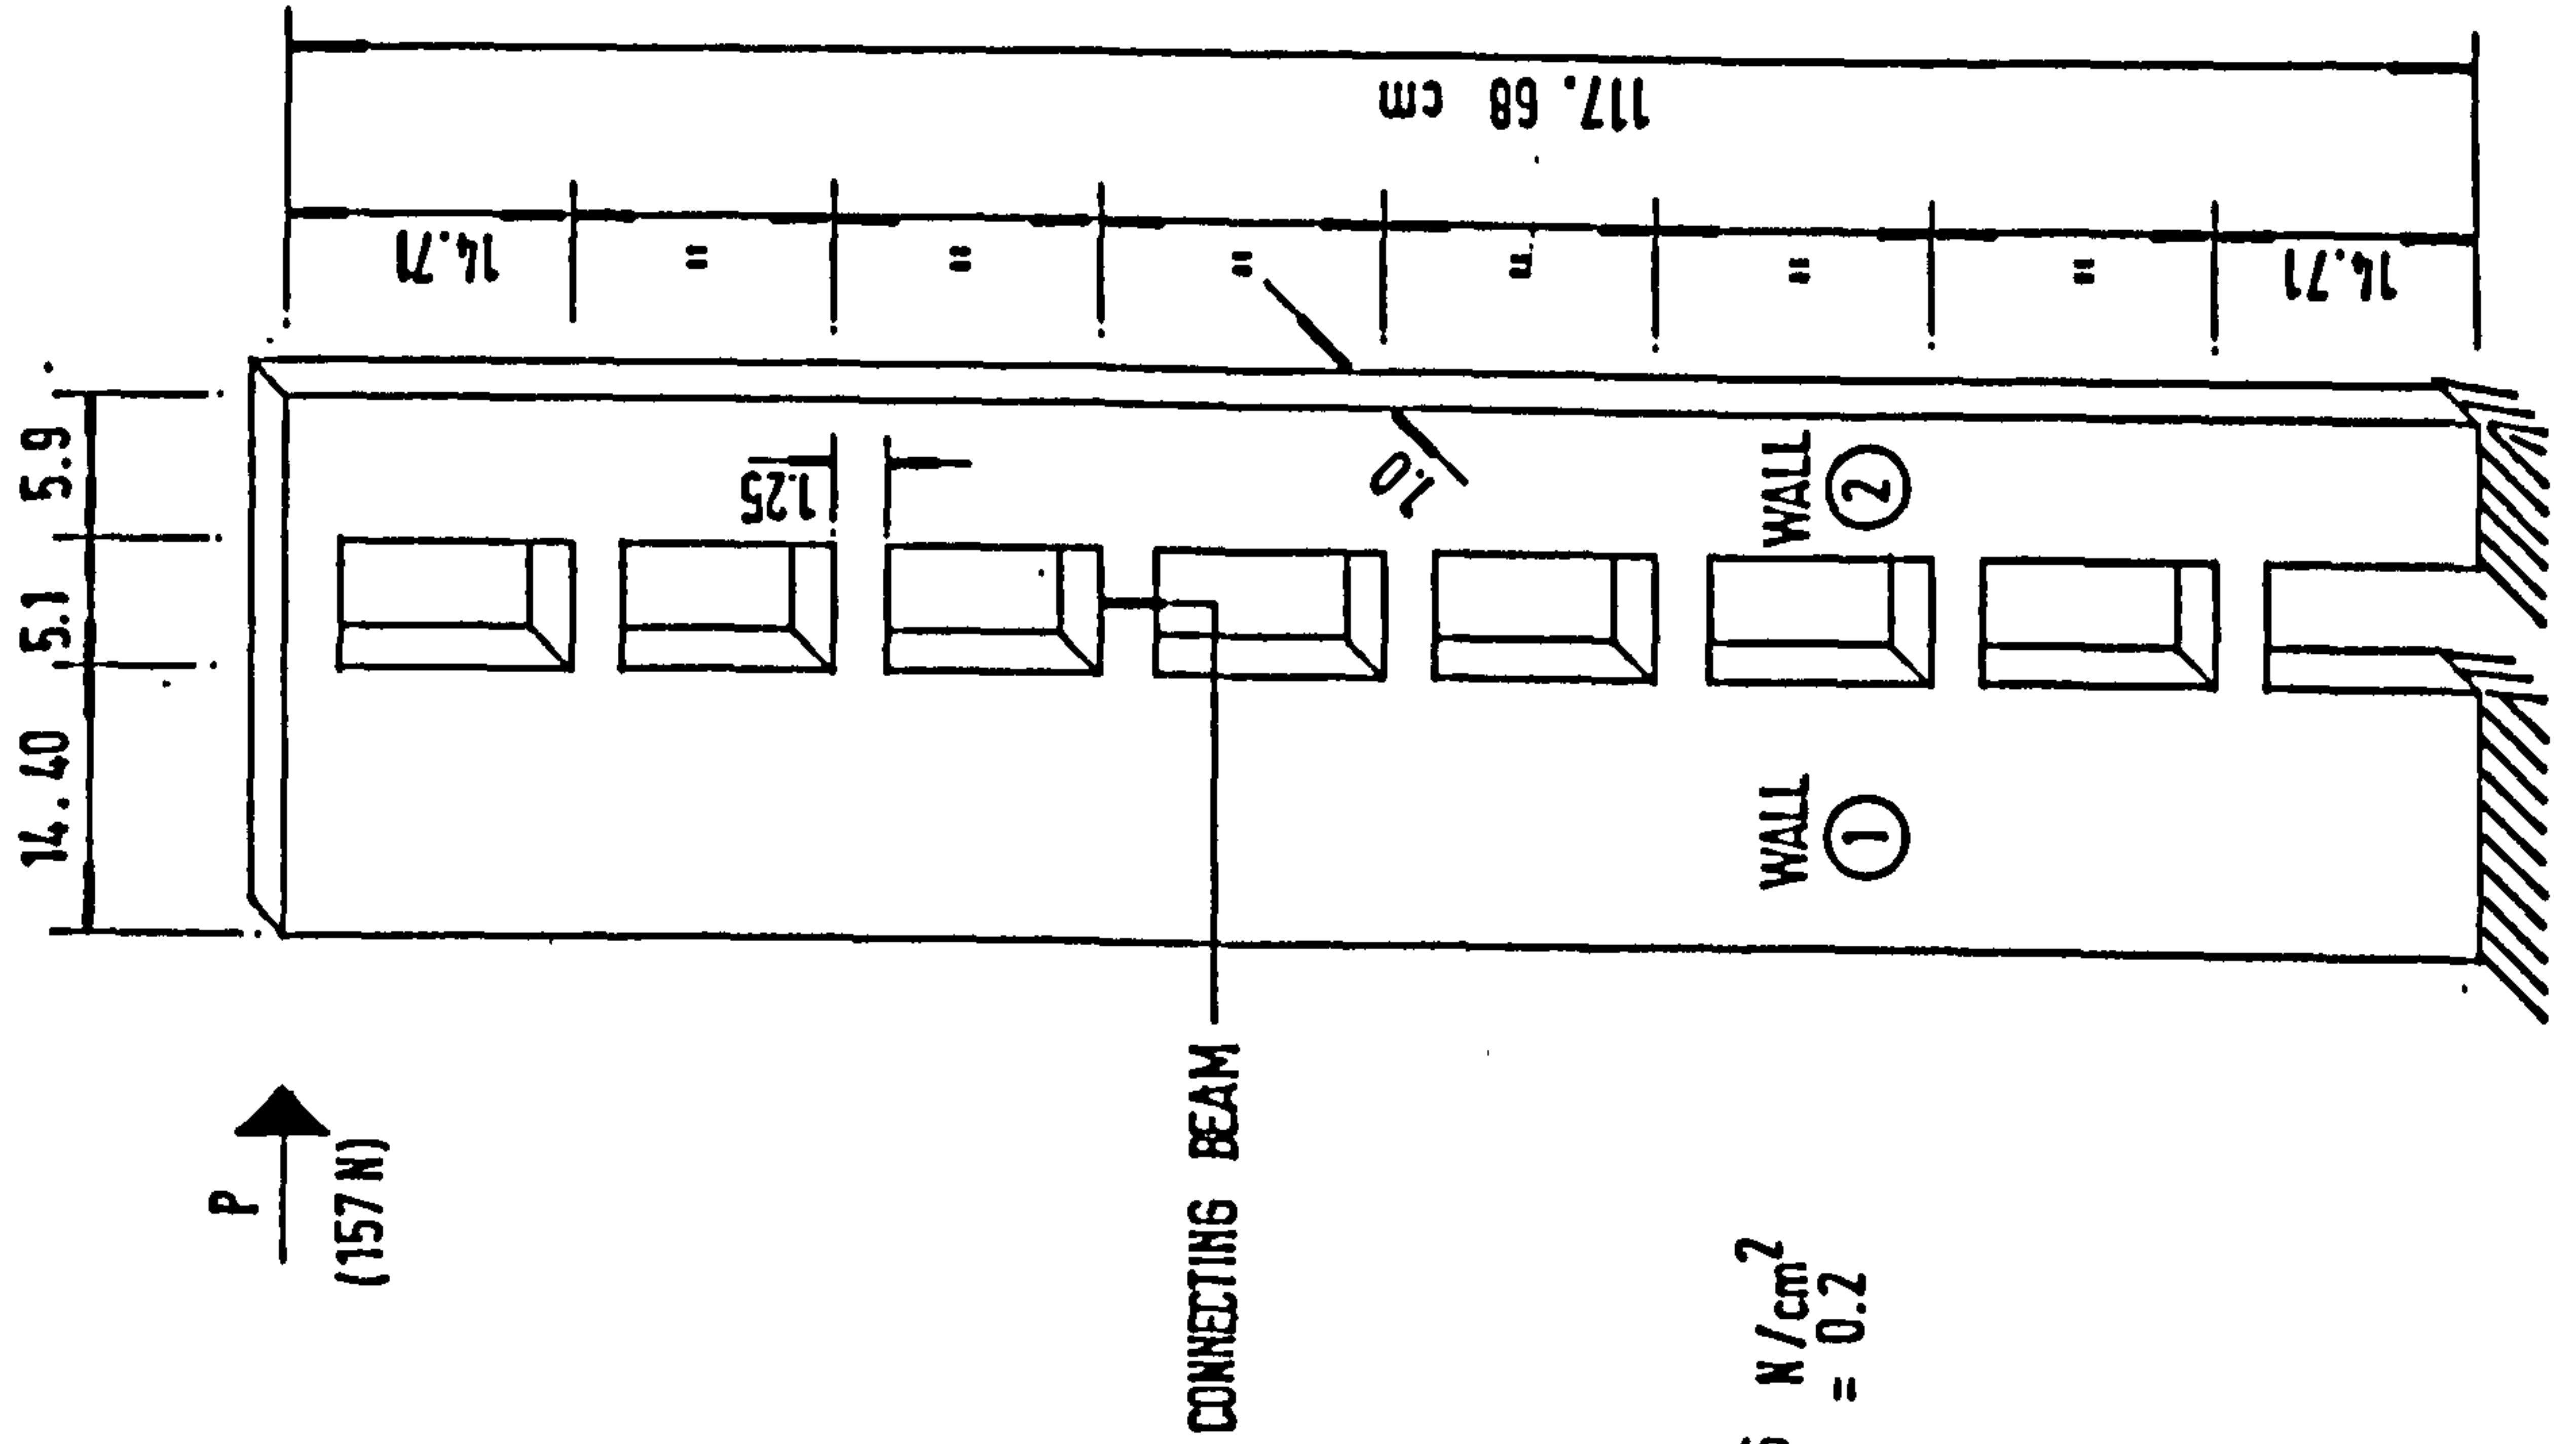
COUPLED SHEAR WALL MODEL ⑫
